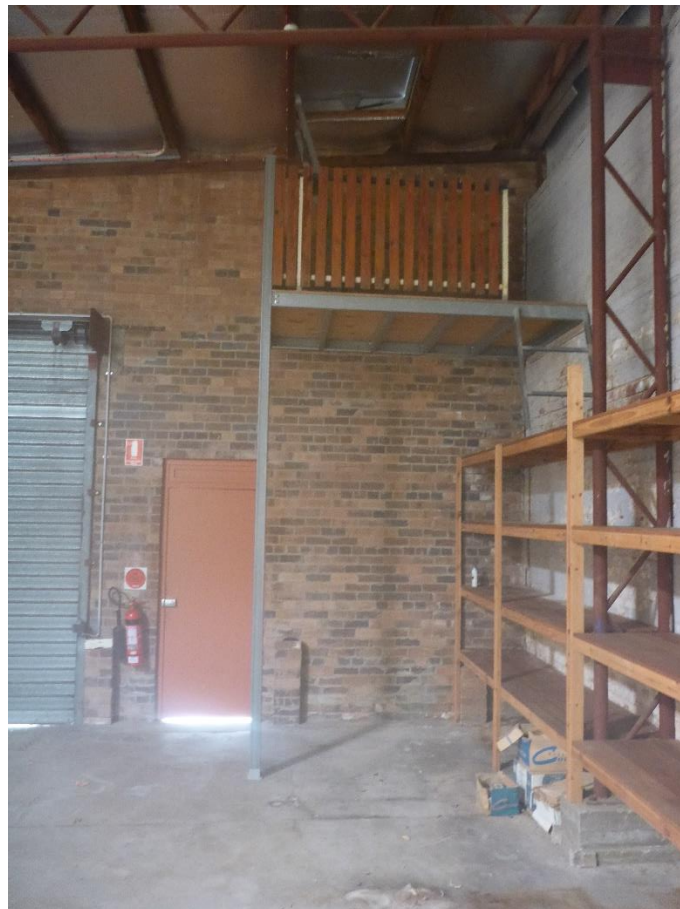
Another view of the contemporary warehouse / carparking space added at the rear of the subject site circa 1970. (Source: VAULT)
